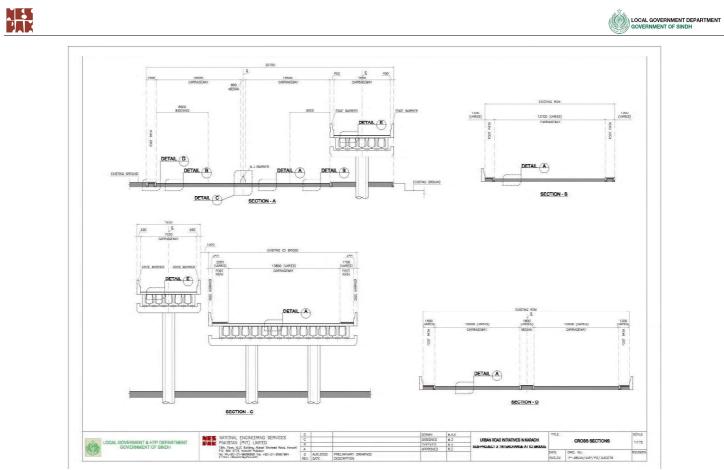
Typical Sections at Interchange at ICI Bridge
